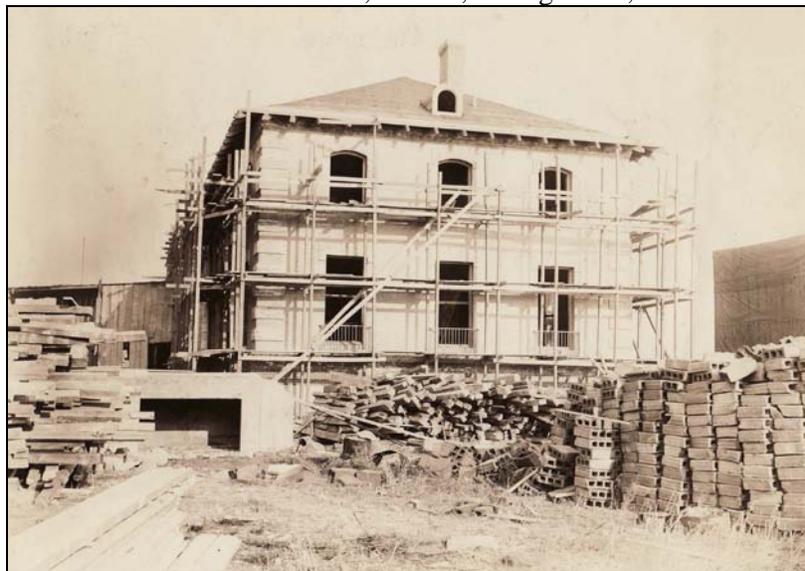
“Staff House Looking Southeast,” (11 January 1908),
